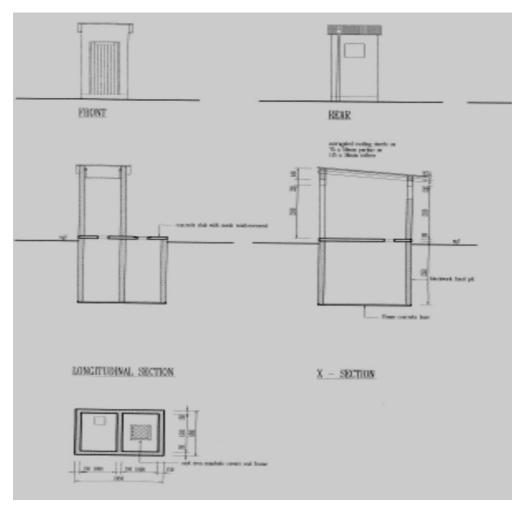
Concrete Lined Pit - Home Based Care Waste Disposal
